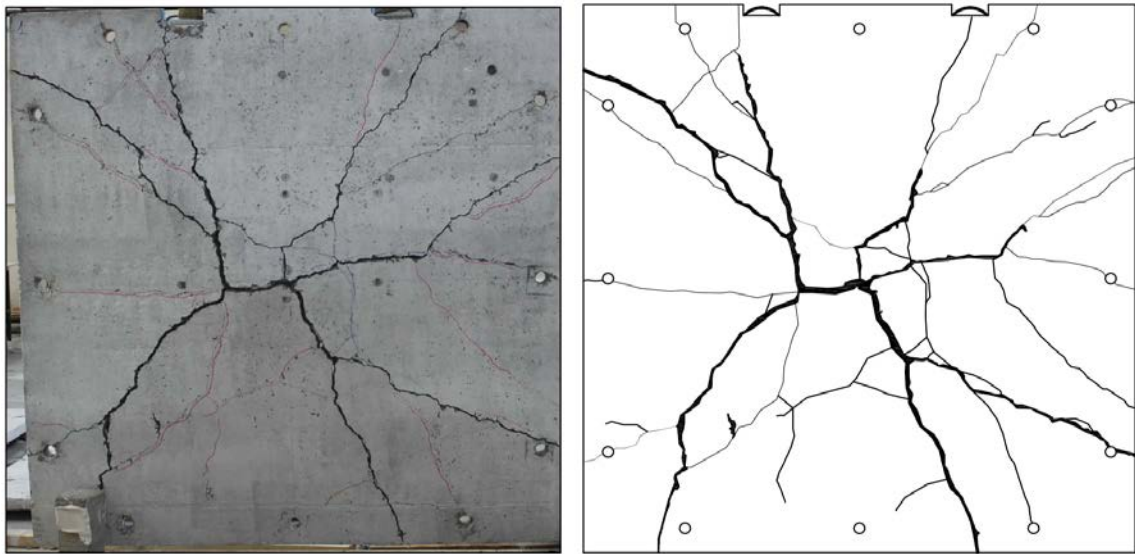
Rear Face Crack Patterns After Testing for Panel JA1-075
